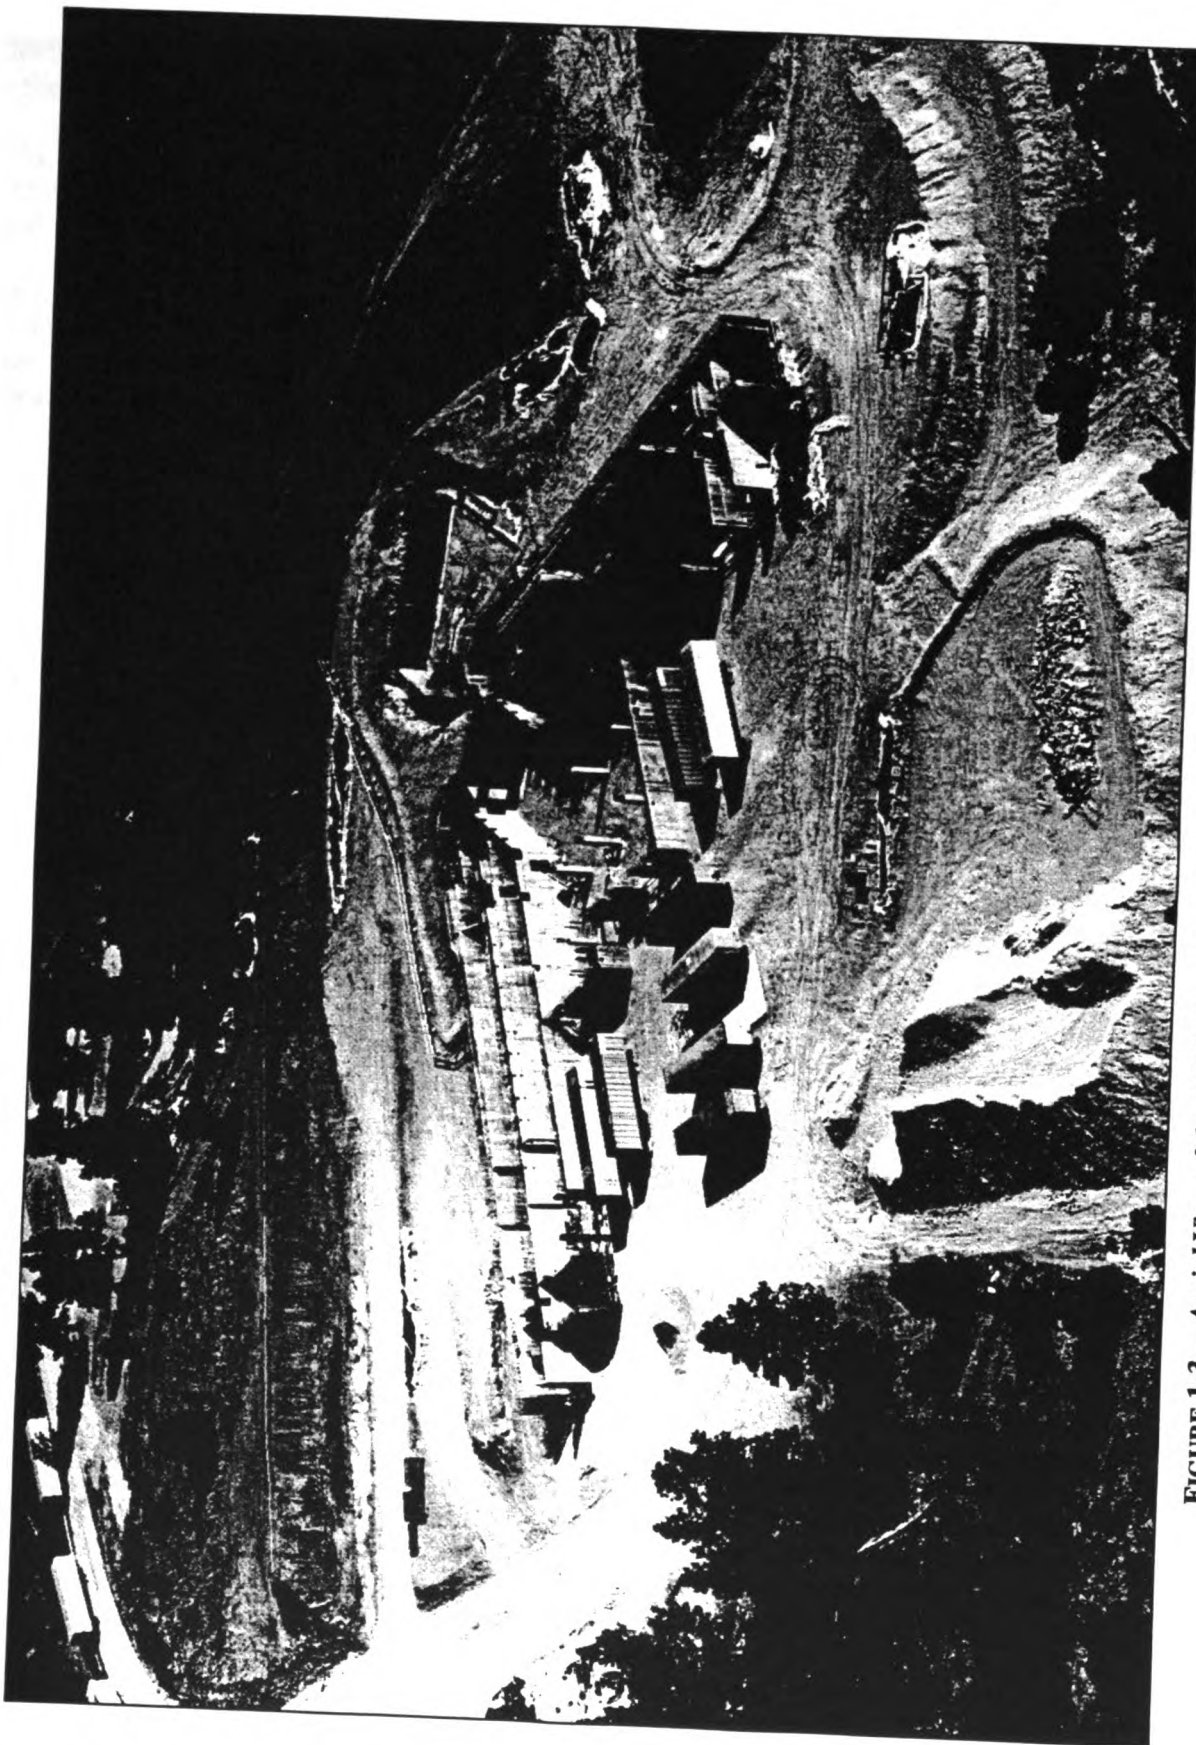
Aerial View of the DARHT Facility Construction Site, as of May 1995 (looking north).
